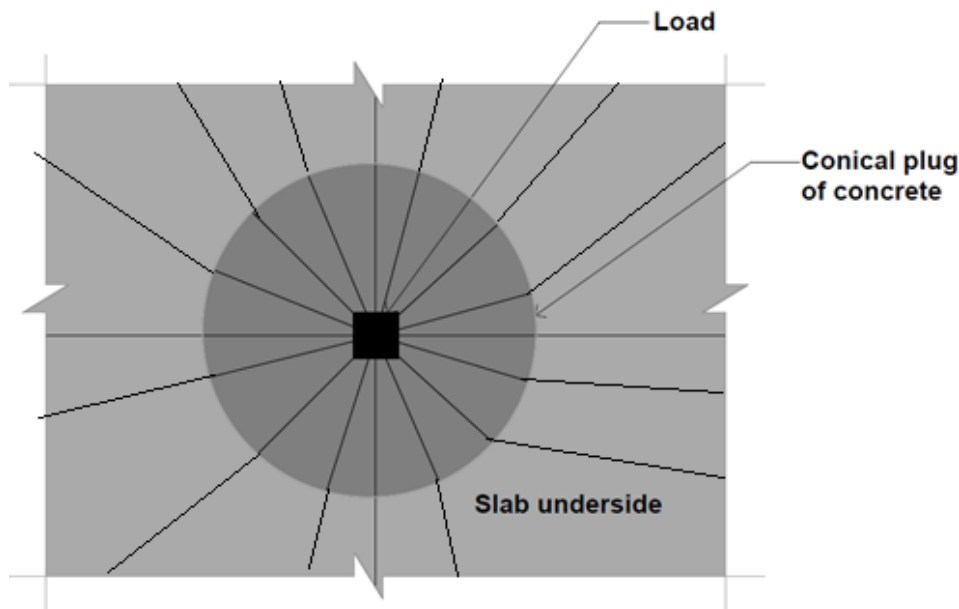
Punching shear failure section in concrete deck due to concentrated load
